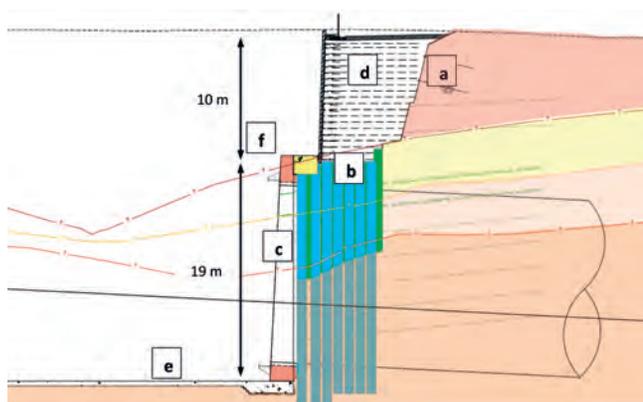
Section through portal headwall showing major features in order of construction sequence. a) Basalt excavation and temporary bolting, b) Weak concrete piled block c) Excavation to maximum depth in front of piled block undertaken concurrently with d) MSE Wall with full height pre-cast concrete facing panels, e) sump base slab constructed then, f) reinforced concrete headwall
